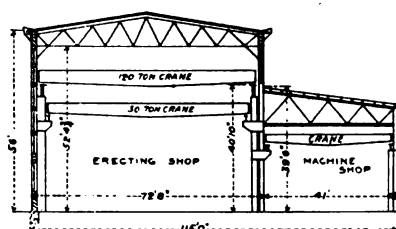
CROSS SECTION OF CROSS ERECTING SHOP, RICHMOND
